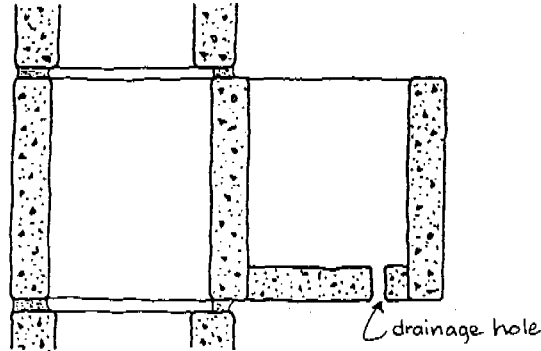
Section through a concrete block container. A floor with a drainage hole is added to the container part of the block.
